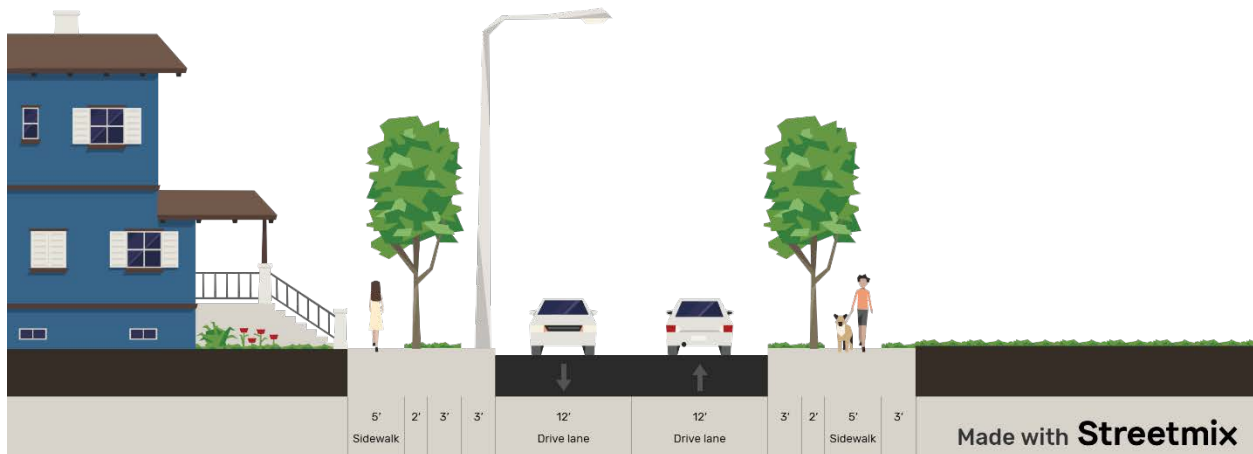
Street cross-section of Ott Street. The park is to the right of the street which has two drive lanes, and sidewalks on either side separated by planting strips. Diagram created in Streetmix by EC, 2022.
